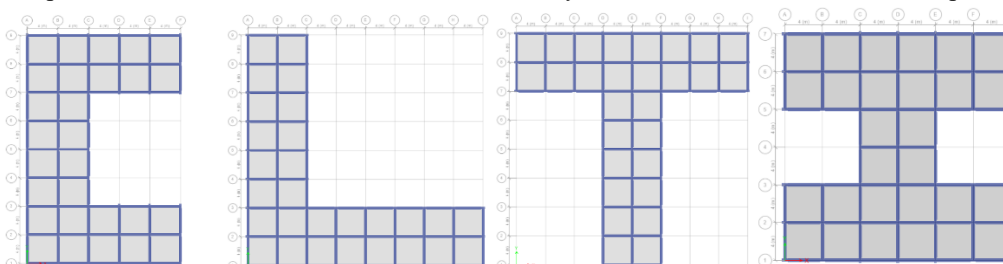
C-Shape Plan Figure 2. L-Shape Plan Figure 3. T-Shape Plan Figure 4. I-Shape Plan
